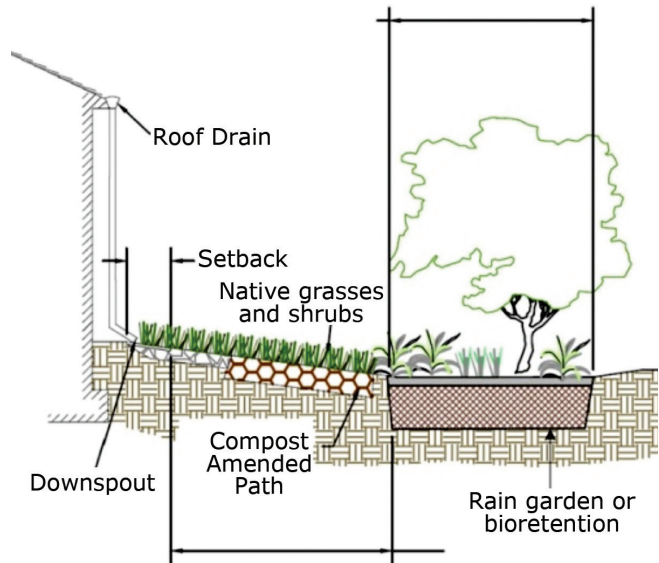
Diagram of rooftop disconnection with compost-amended filter path and bioretention.
